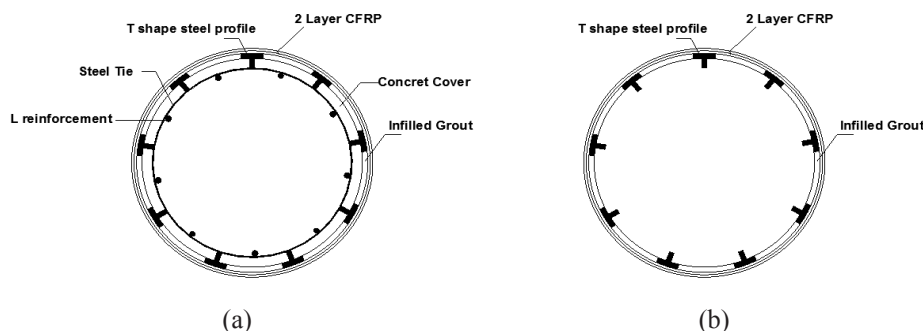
Schematic view of proposed scheme, a) For RC columns b) For plain concrete columns
